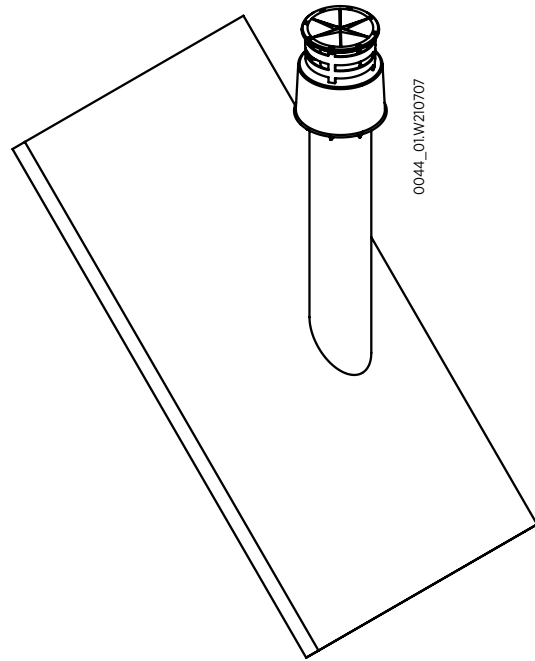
Waste gas vertical outlet chimney set and Pitched Roof Outlet Tile part installation for Roof
